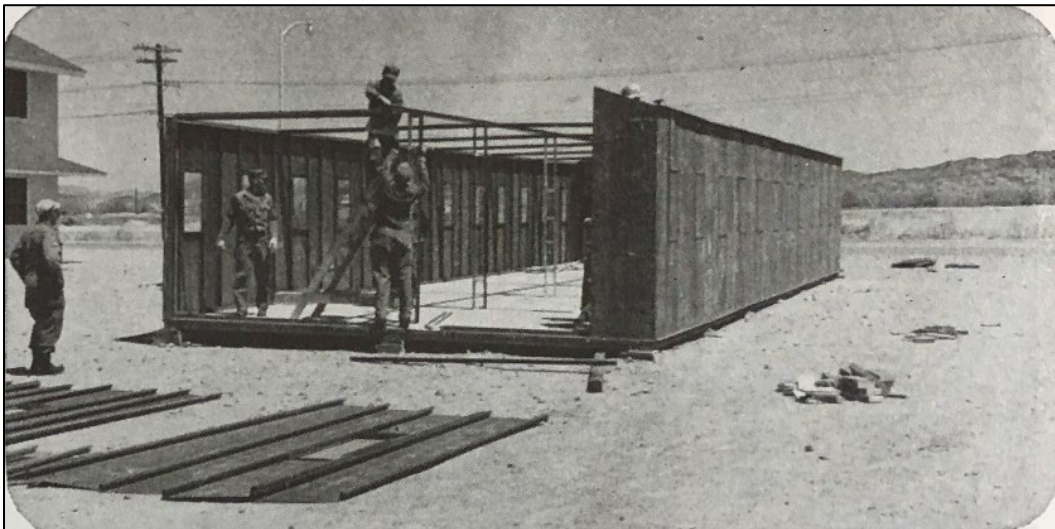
An oblique of the “Armed Forces Building” resting on concrete block foundations due to the structures low weight, 1952 (American Rolling Mill Company, “Armed Forces Building,” *The Military Engineer* 44, no. 298 (March–April. 1952): 15).
